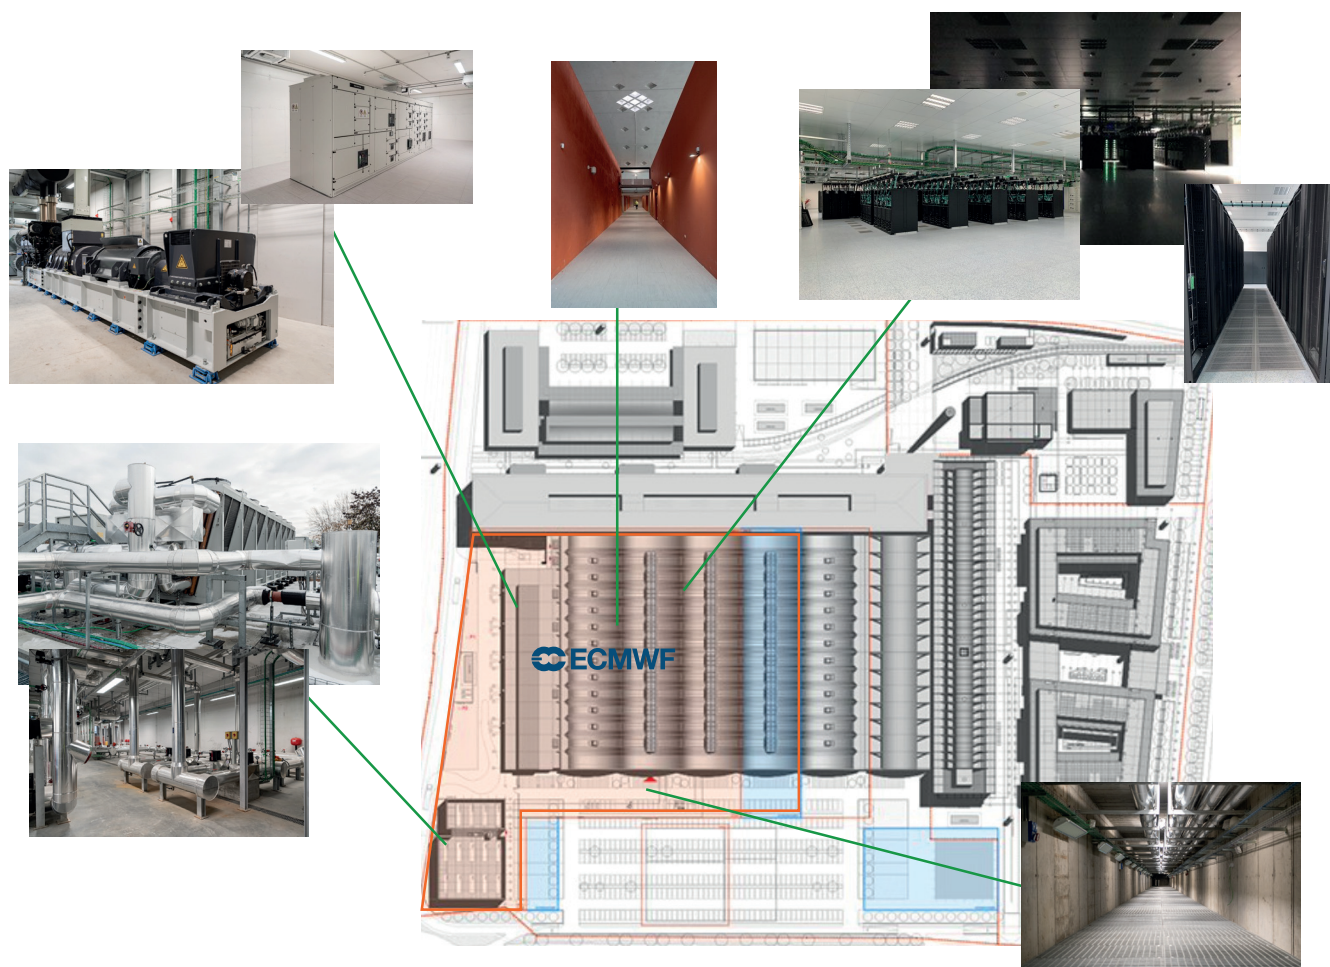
Starting on the bottom left, the images show the L2 building with chillers on the roof and the mechanical plant inside; followed above by the newly refurbished technical block showing the DRUPS and one of the switchboard rooms; to the right a 100 m long corridor and the HPCF in the data halls; and to the bottom a tunnel bringing in cold water to the data halls.
